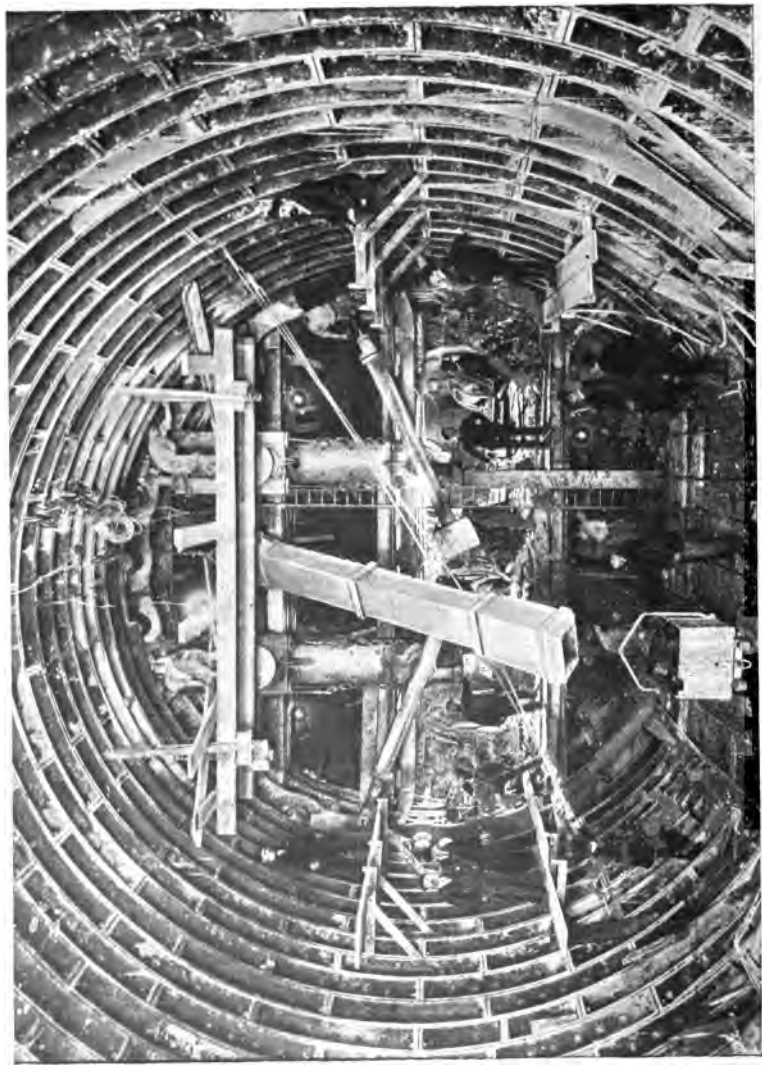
At work in a station tunnel, South London Tube Railway.
